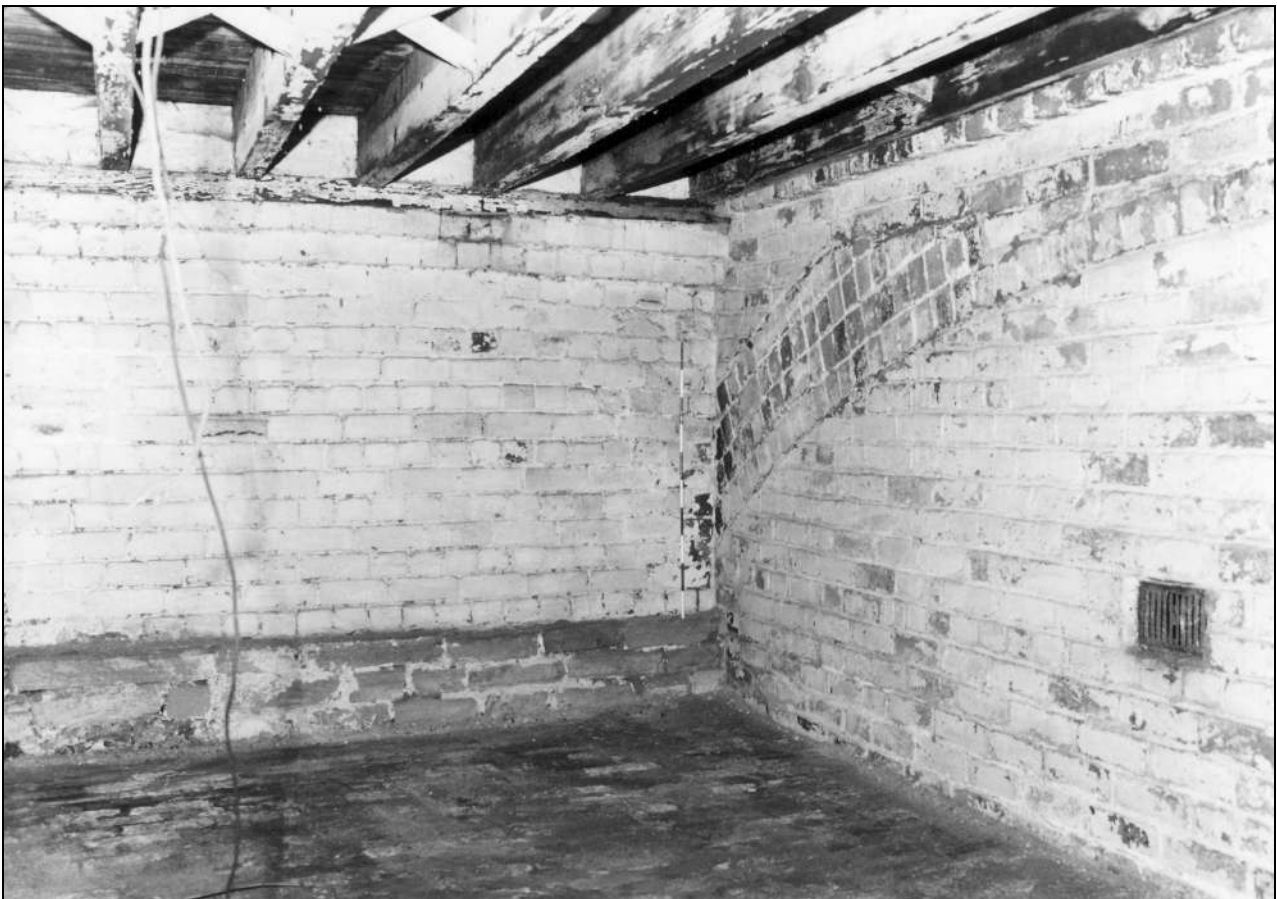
Bay 1: basement, from the south-west (film 4, frame 9)
